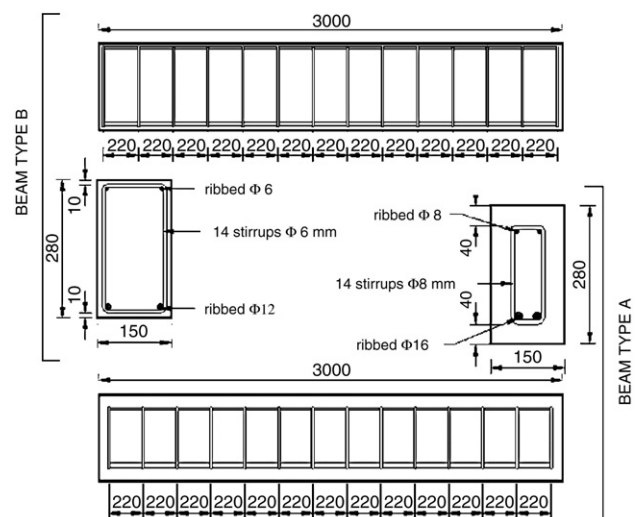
Lay-out of the reinforcement (all dimensions in mm) for type B beams.
